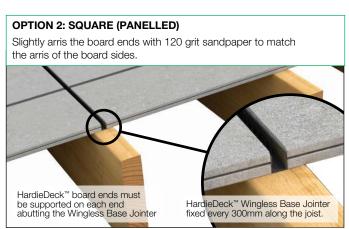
B DECKING BOARD SQUARED BUTT JOINTS
